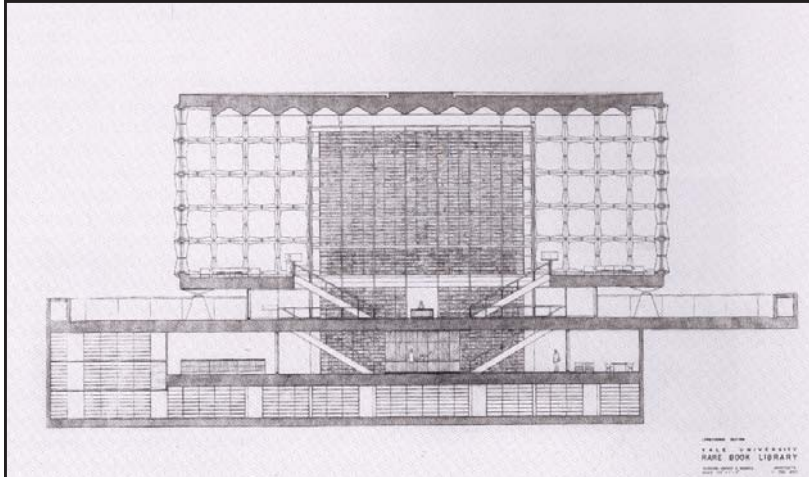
Section showing the exterior cladding and interior book storage.
